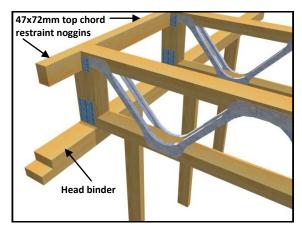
Bottom Chord Fixing to Timber Frame (with restraint noggins)
